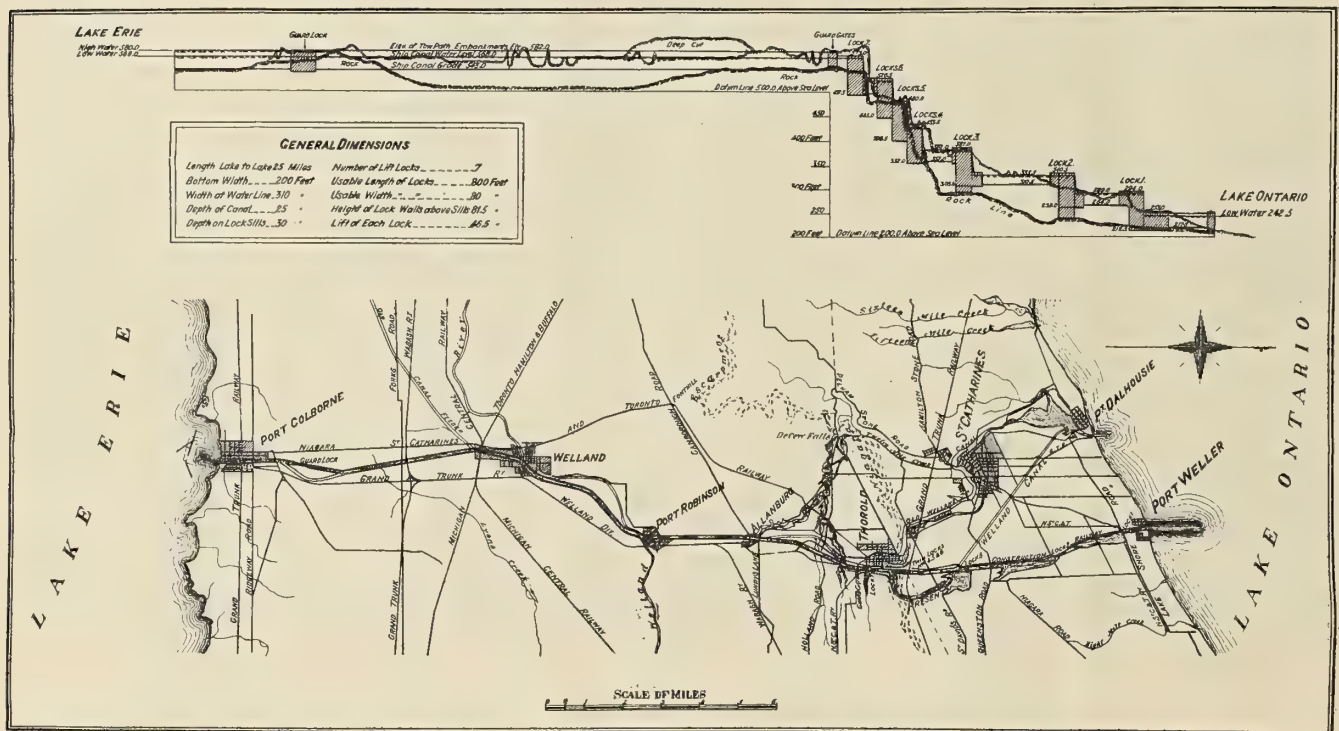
Plan and Elevation of New Welland Ship Canal
